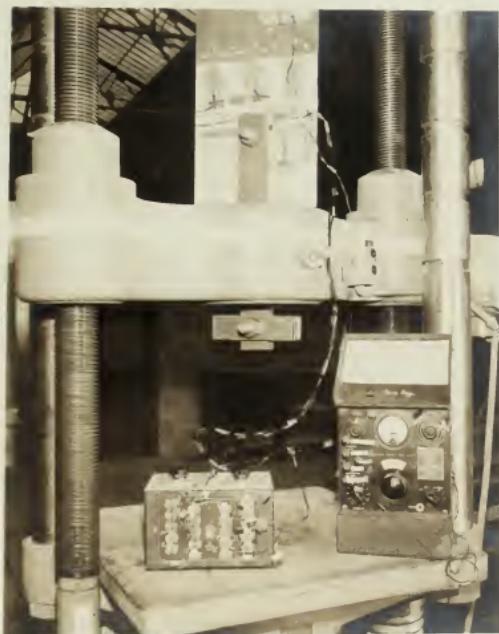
Specimen mounted in testing machine. Close-up, showing tee-section used in place of standard grips.
